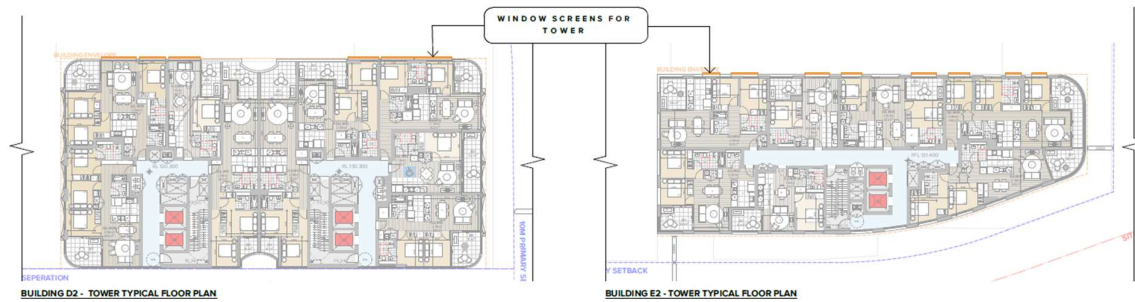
Plan of window screen locations on towers D2 and E2 which protrude beyond the approved envelope by approximately 250mm (Source: Turner Studio)
